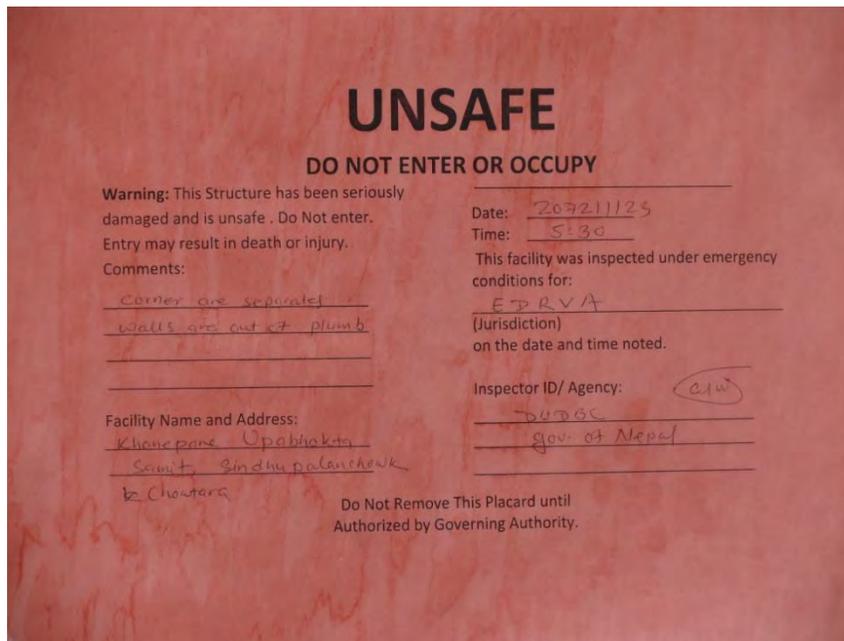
UNSAFE placard on heavily damaged government office building in Chautara, Sindhupalchowk (photo: Hemant Kaushik).
